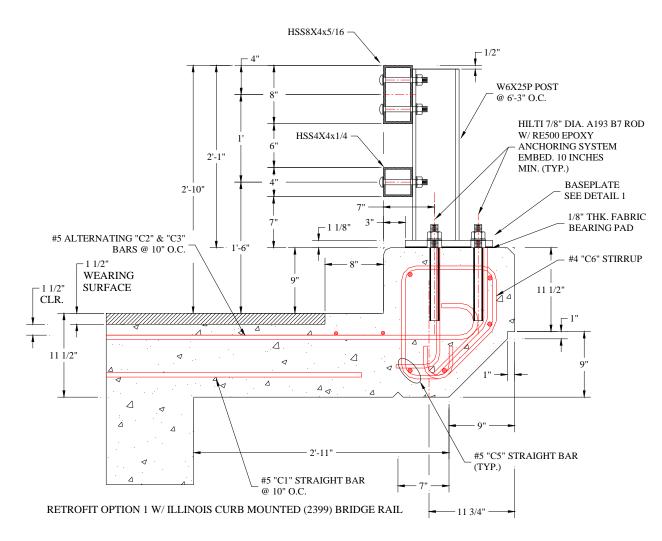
Cross Section of Illinois 2399-1 Bridge Railing Retrofit Design
